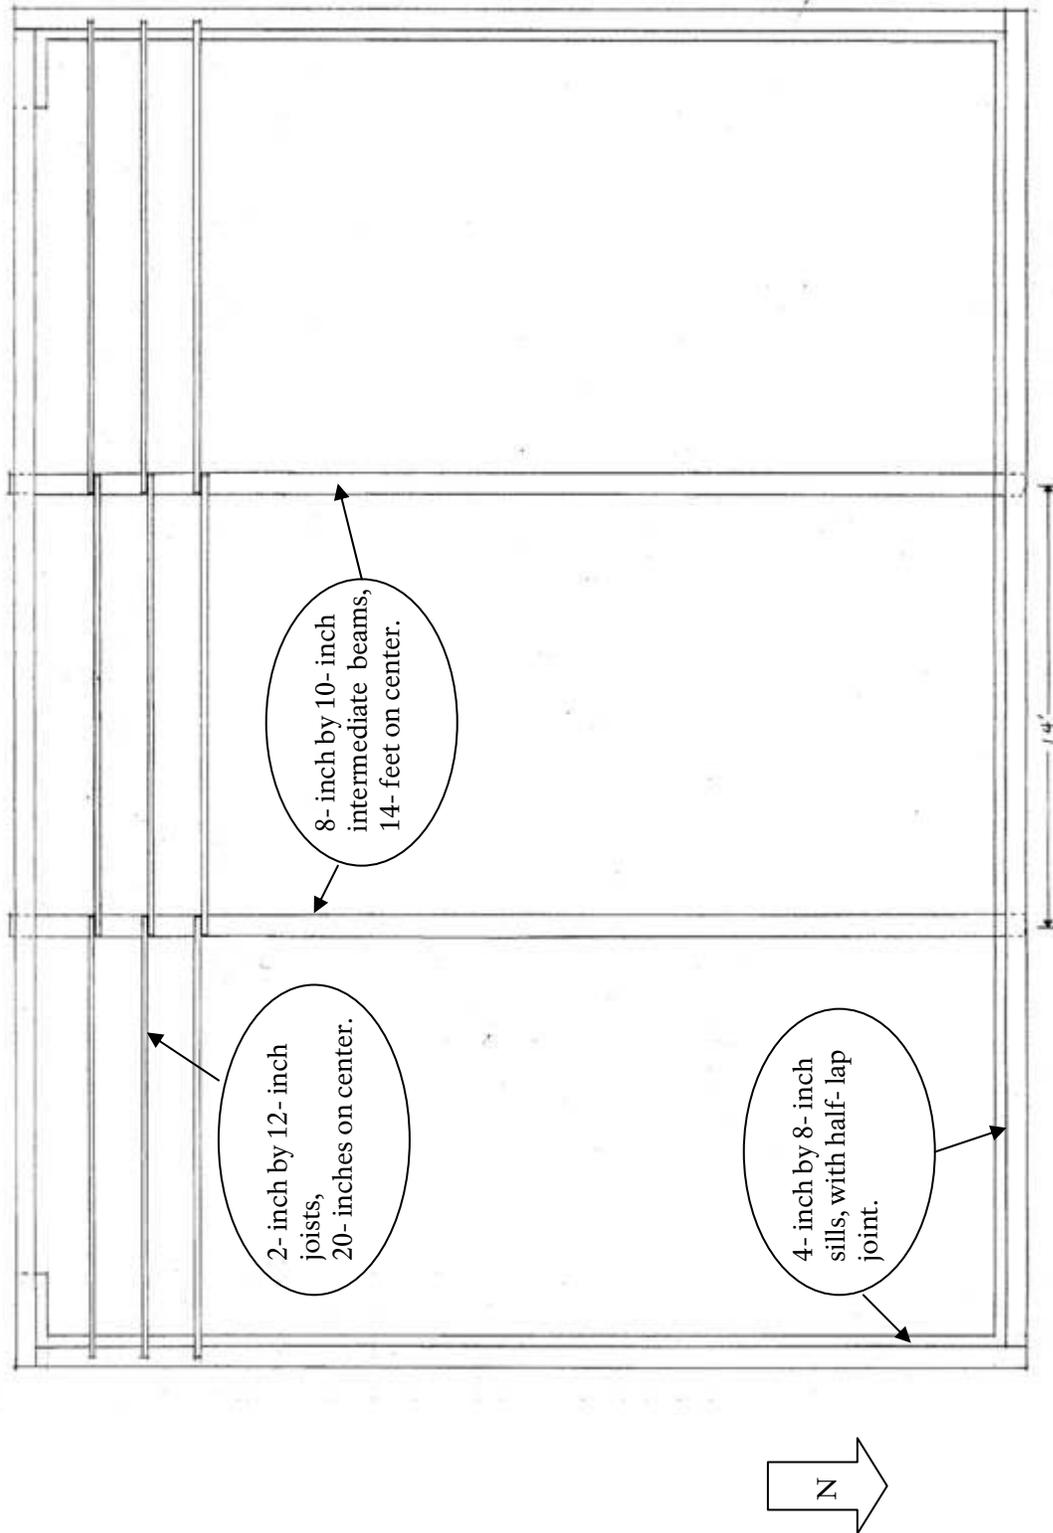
Schematic plan of New Barn basement framing, depicting foundation, summer beams, sills and typical joist construction, not to scale, drawn by James Lee, September, 2005.
